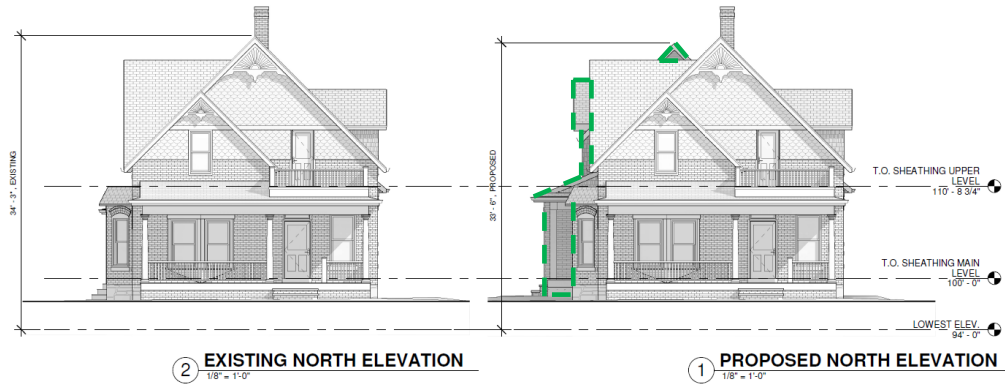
Existing (left) and proposed (right), new construction in green, north elevation (façade)
